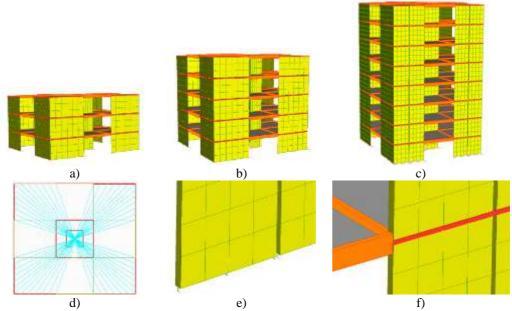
View of the adopted FE model: a) 3AR configuration, b) 5AI configuration, c) 8BR configuration, d) rigid story diaphragm detail, e) base connection detail and f) inter story connection detail
